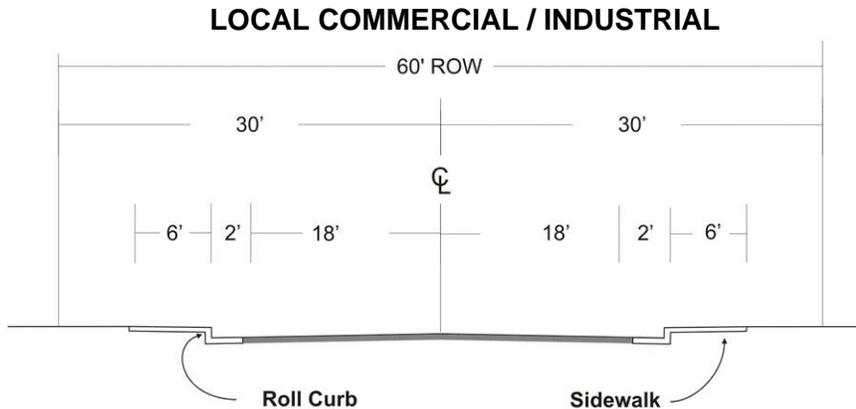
ROADWAY CROSS SECTIONS (Continued)
